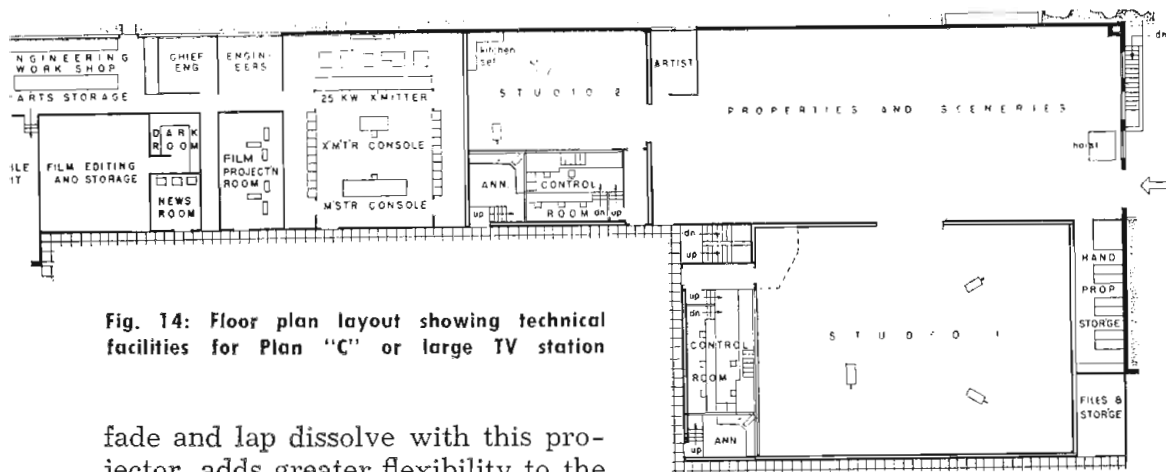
Floor plan layout showing technical facilities for Plan "C" or large TV station
